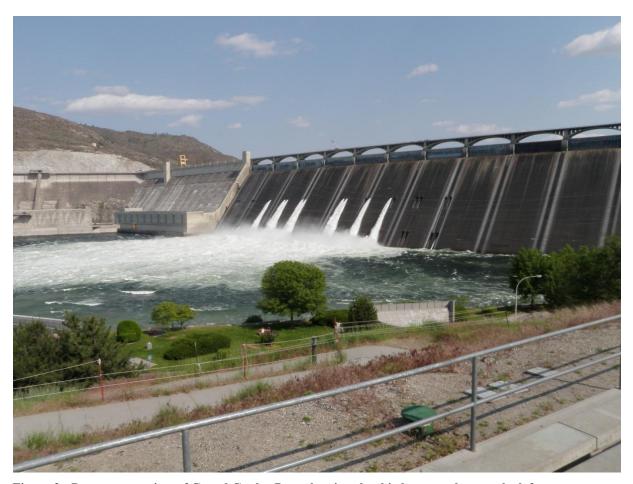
Downstream view of Grand Coulee Dam showing the third power plant on the left and 40 river outlets on the face of original dam below the spillway crest.
